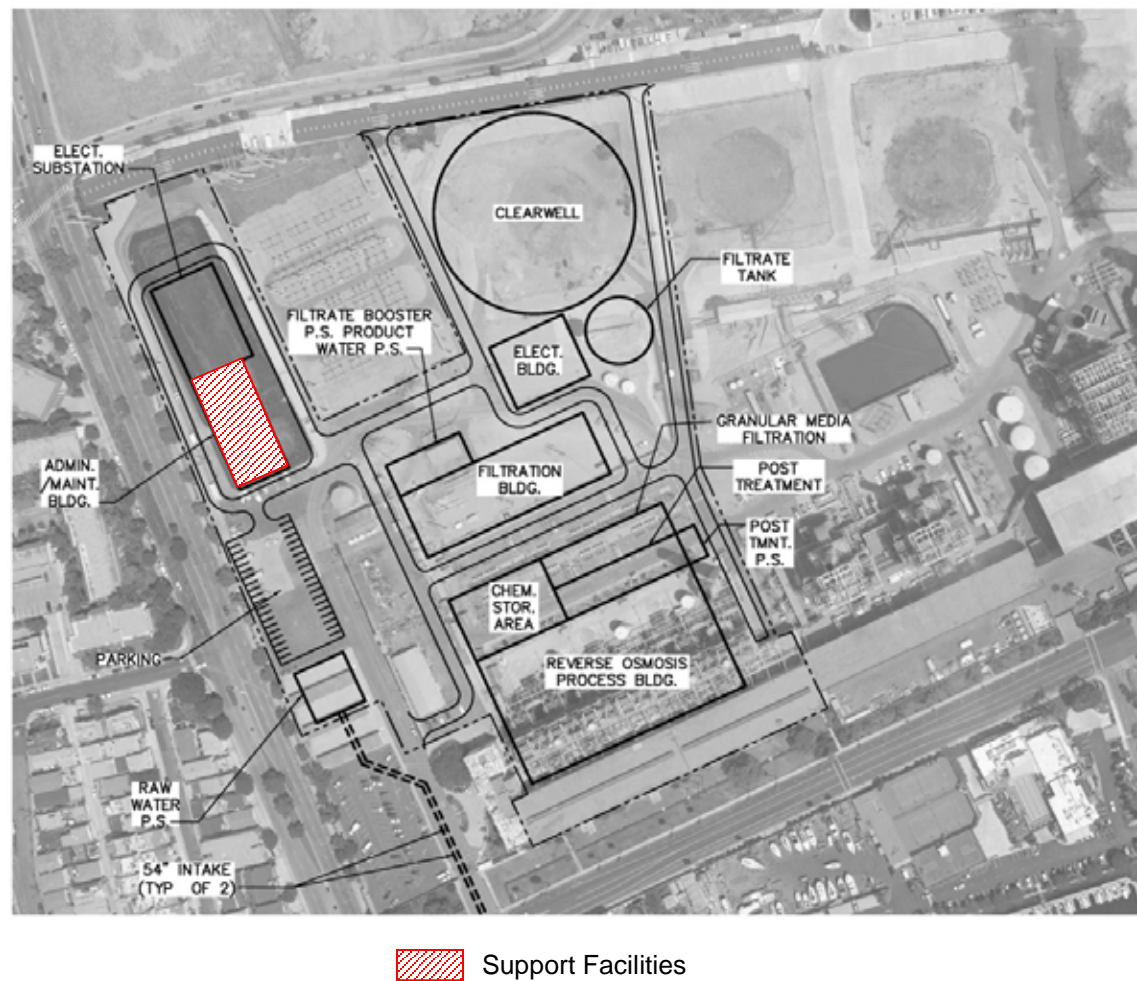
AES Preliminary Site Layout – 60 MGD Support Facilities
